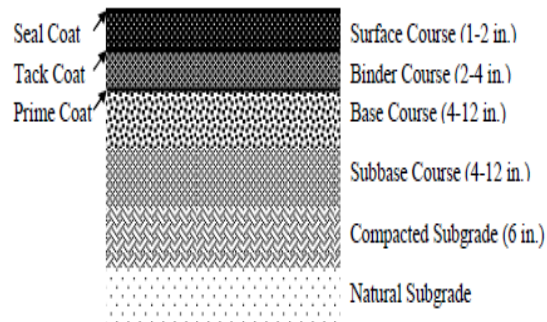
Typical Cross Section of Conventional Flexible Pavement (Huang, 2004)
